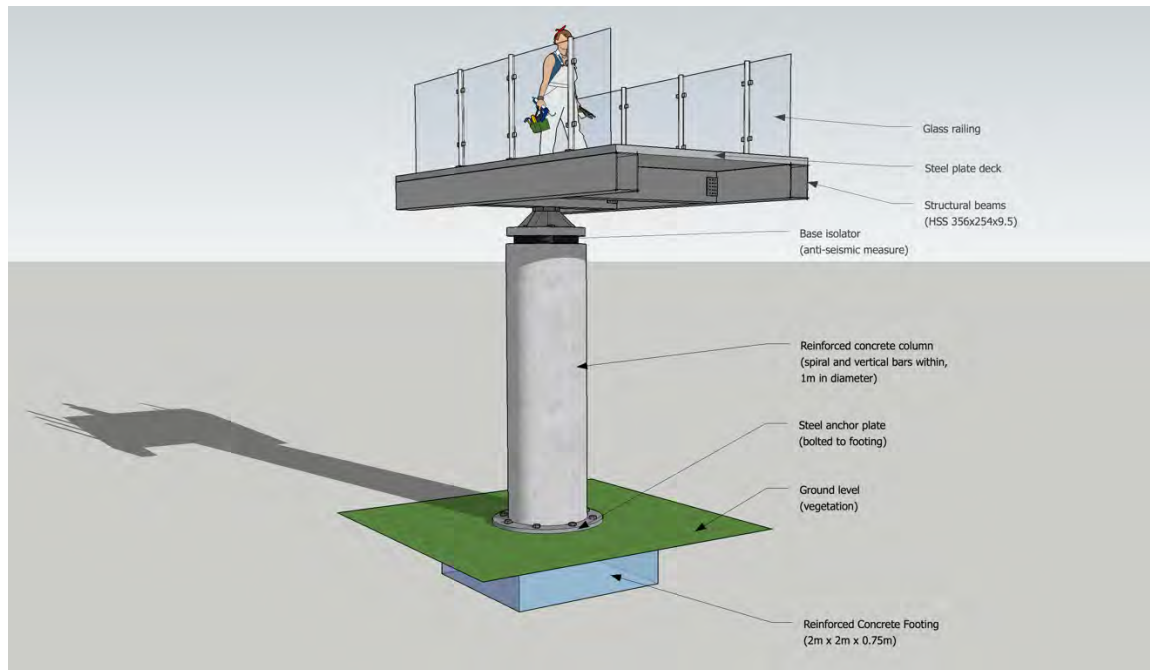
Pedestrian Lookout Platform Handrail Components
